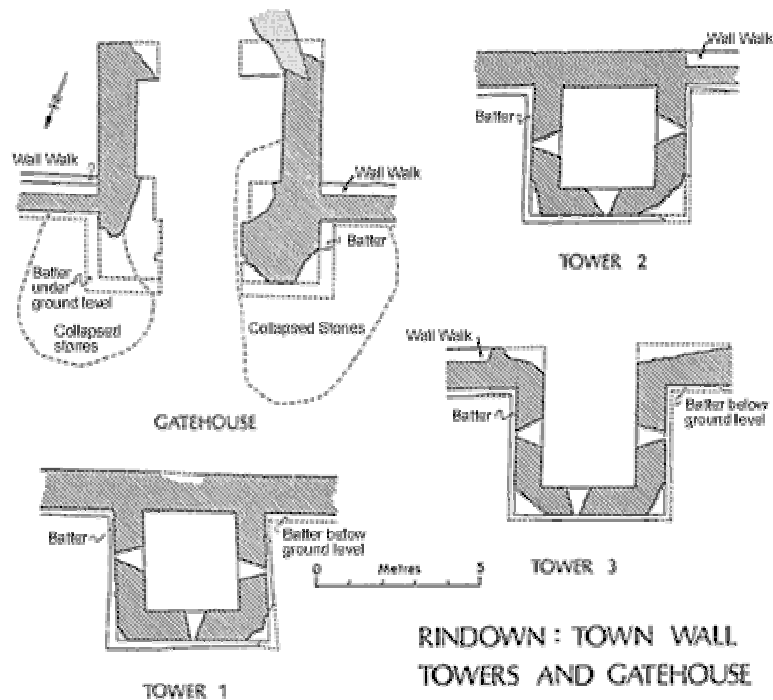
Ground plan of the town wall mural towers and the gatehouse.
